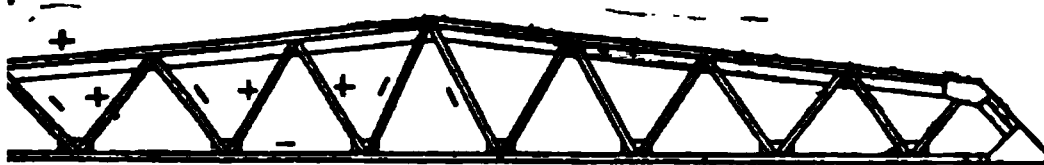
Pratt-truss Type. Pier-shed, New York City. Span Ninety-six Feet
